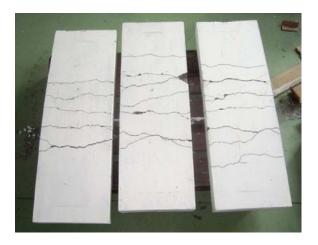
Typical Crack Pattern on Reinforced Concrete Panels.
